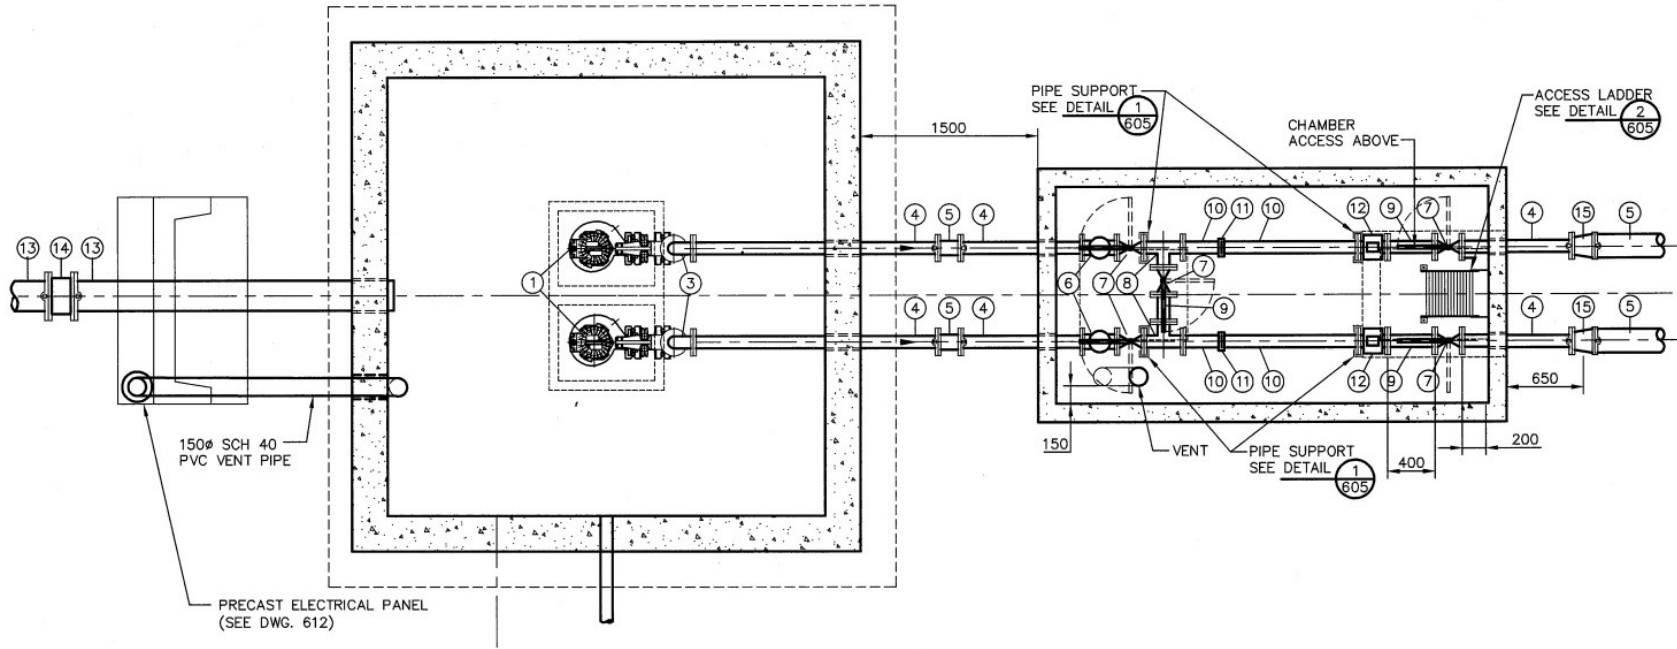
Akerley Boulevard physical layout – lift-station plan view.
